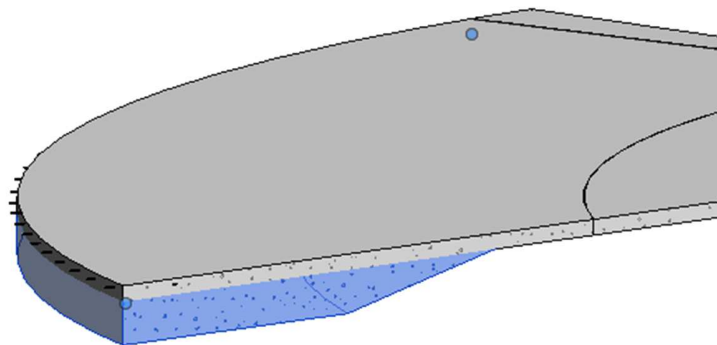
FOUNDATION PERSPECTIVE SECTION
